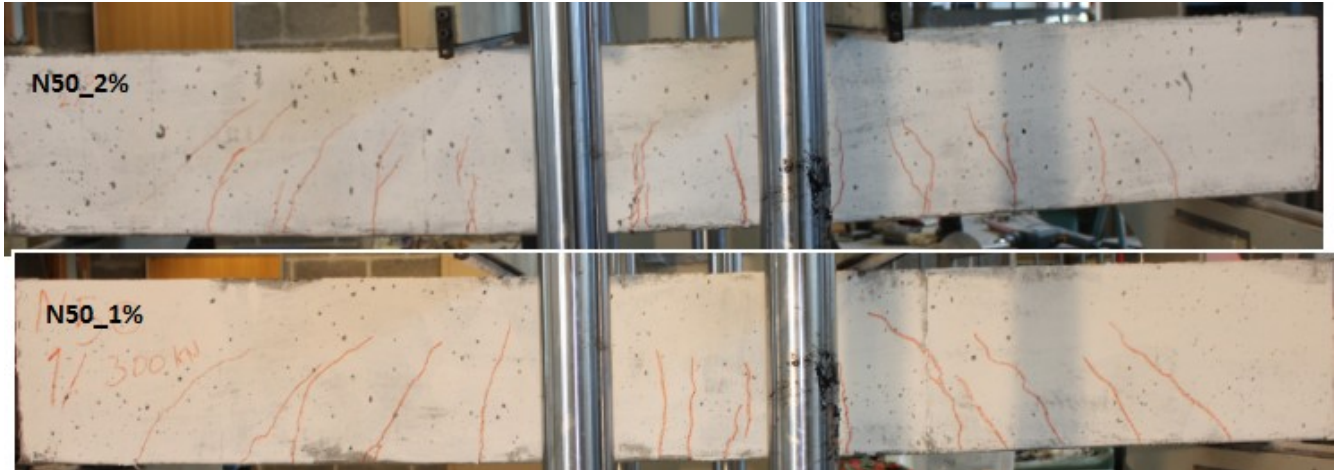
Crack pattern beam LWC\_N50 (2% and 1%).
